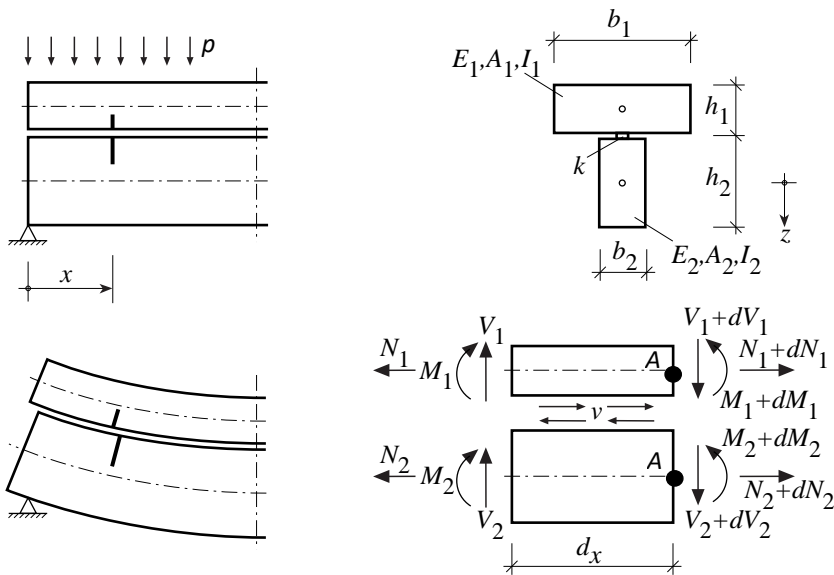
Mechanically jointed cross-section comprising two components: Dimensions, forces and moments. $A' = dA/dx$. (STEP 1995 Article B11)
